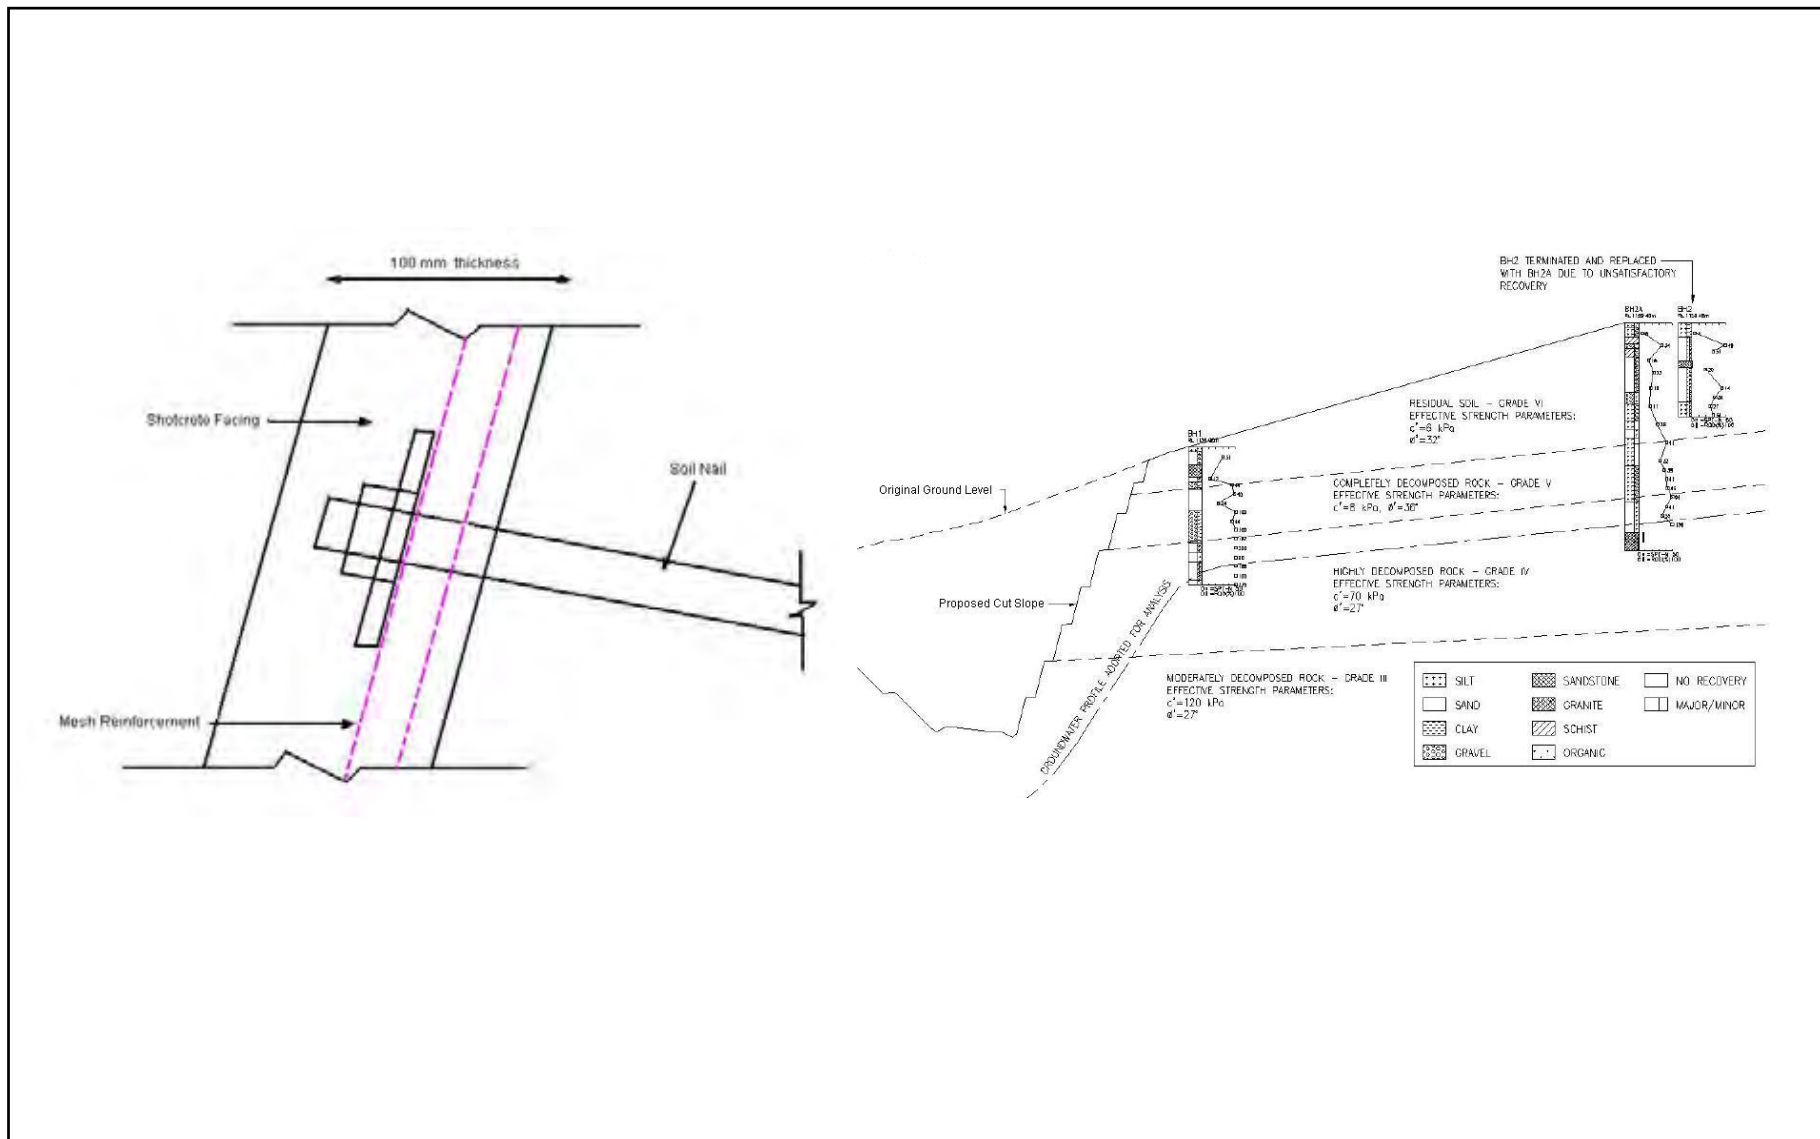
Cross Section of the 45 m High Soil-nailed Slope and Details of the Guniting Facing (Extracted from Liew & Liong (2006))
